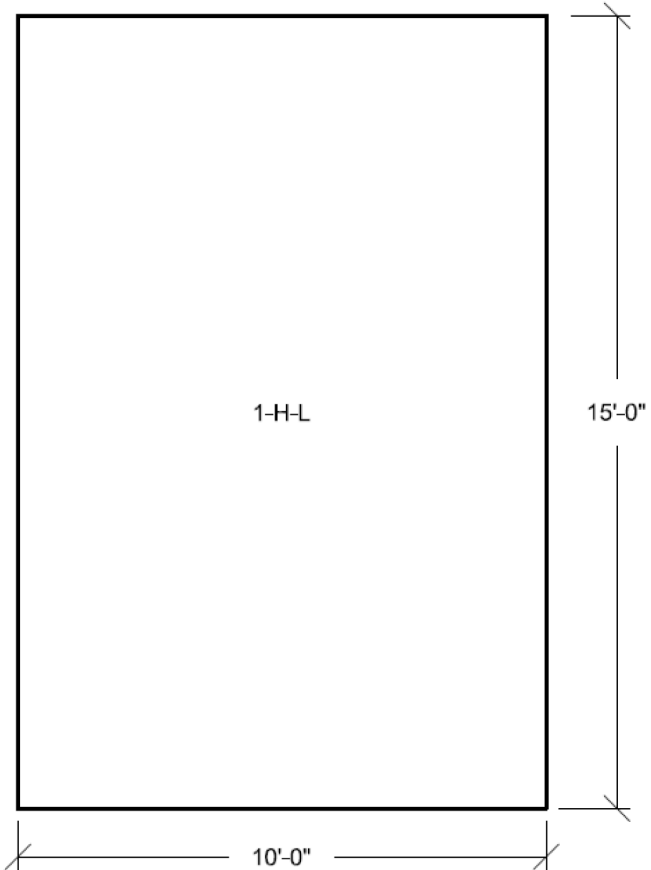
H.6-204 DGFOVS Wall 16 Looking From Outside
